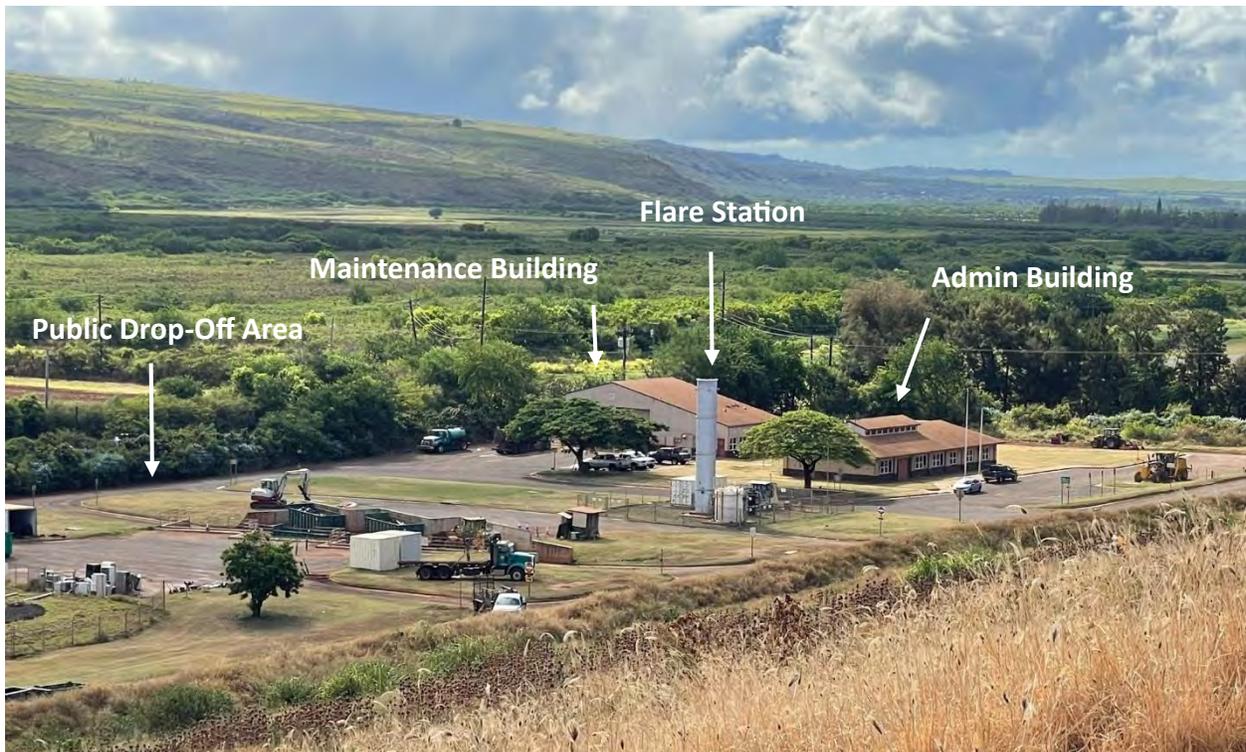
View towards northeast from Phase II landfill looking towards the public drop-off area, flare station, maintenance building, and administrative building.
